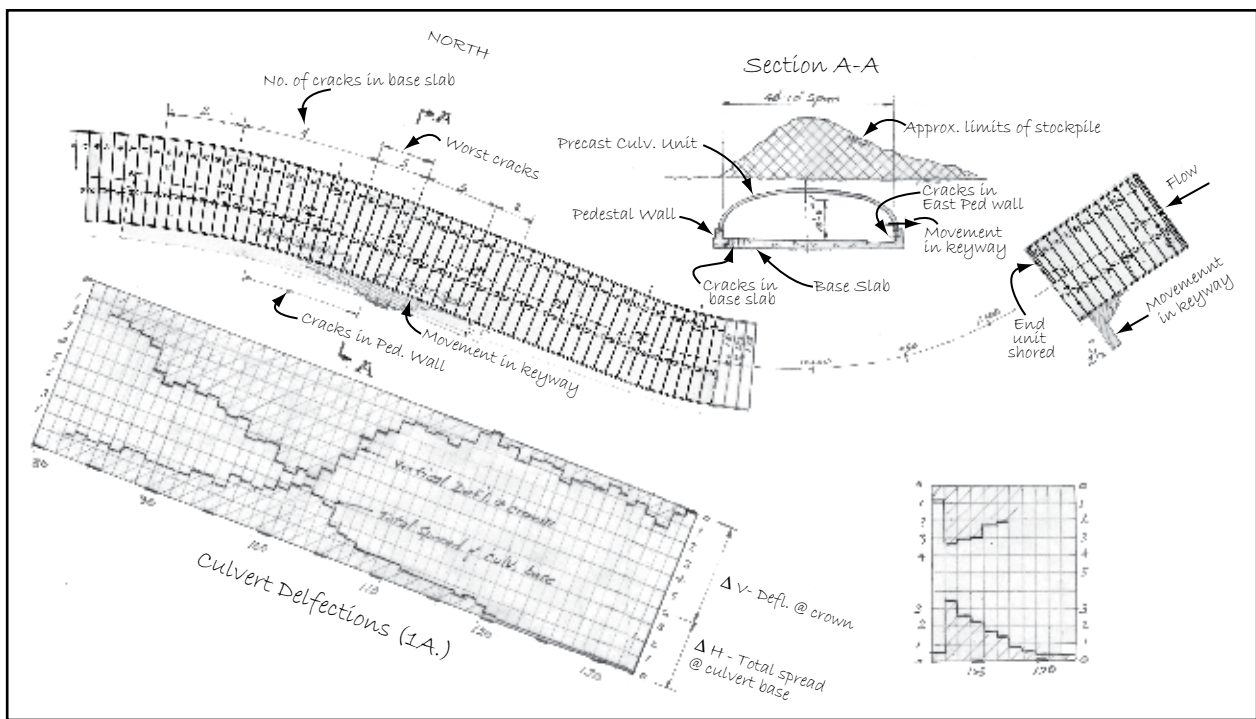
Field notes prepared by CON/SPAN® summarizing visually observable and measurable damage to culvert precast elements, base slab and knee walls.
